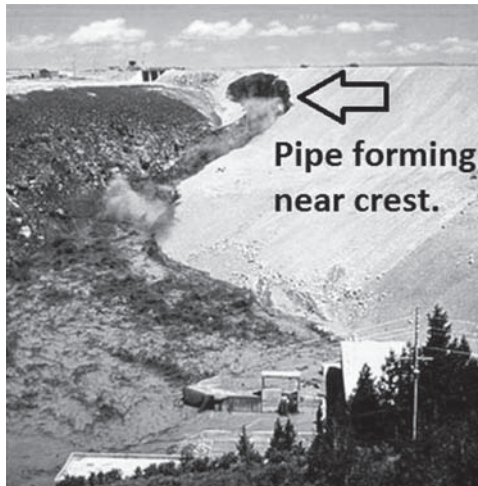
Teton Dam showing piping underway near the crest (Chadwick et al. 1976)
